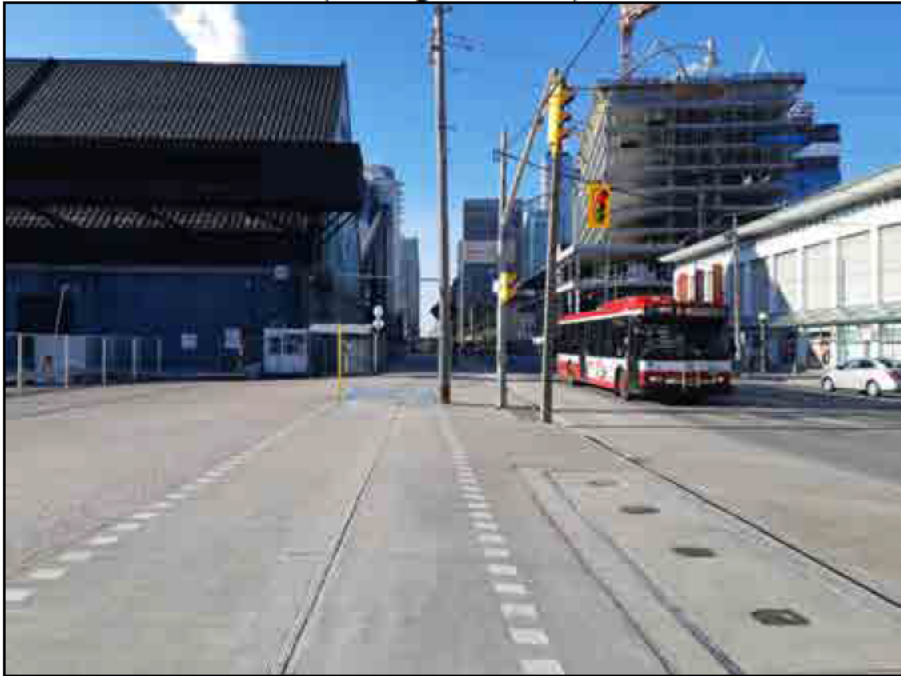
Queens Quay at Bay Street, Southern ROW (looking northeast)
